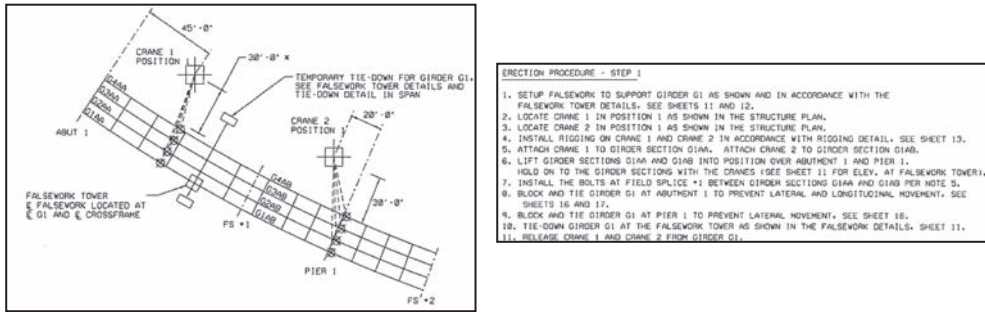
Sample stage of a bridge erection procedure with portion of write-up.
